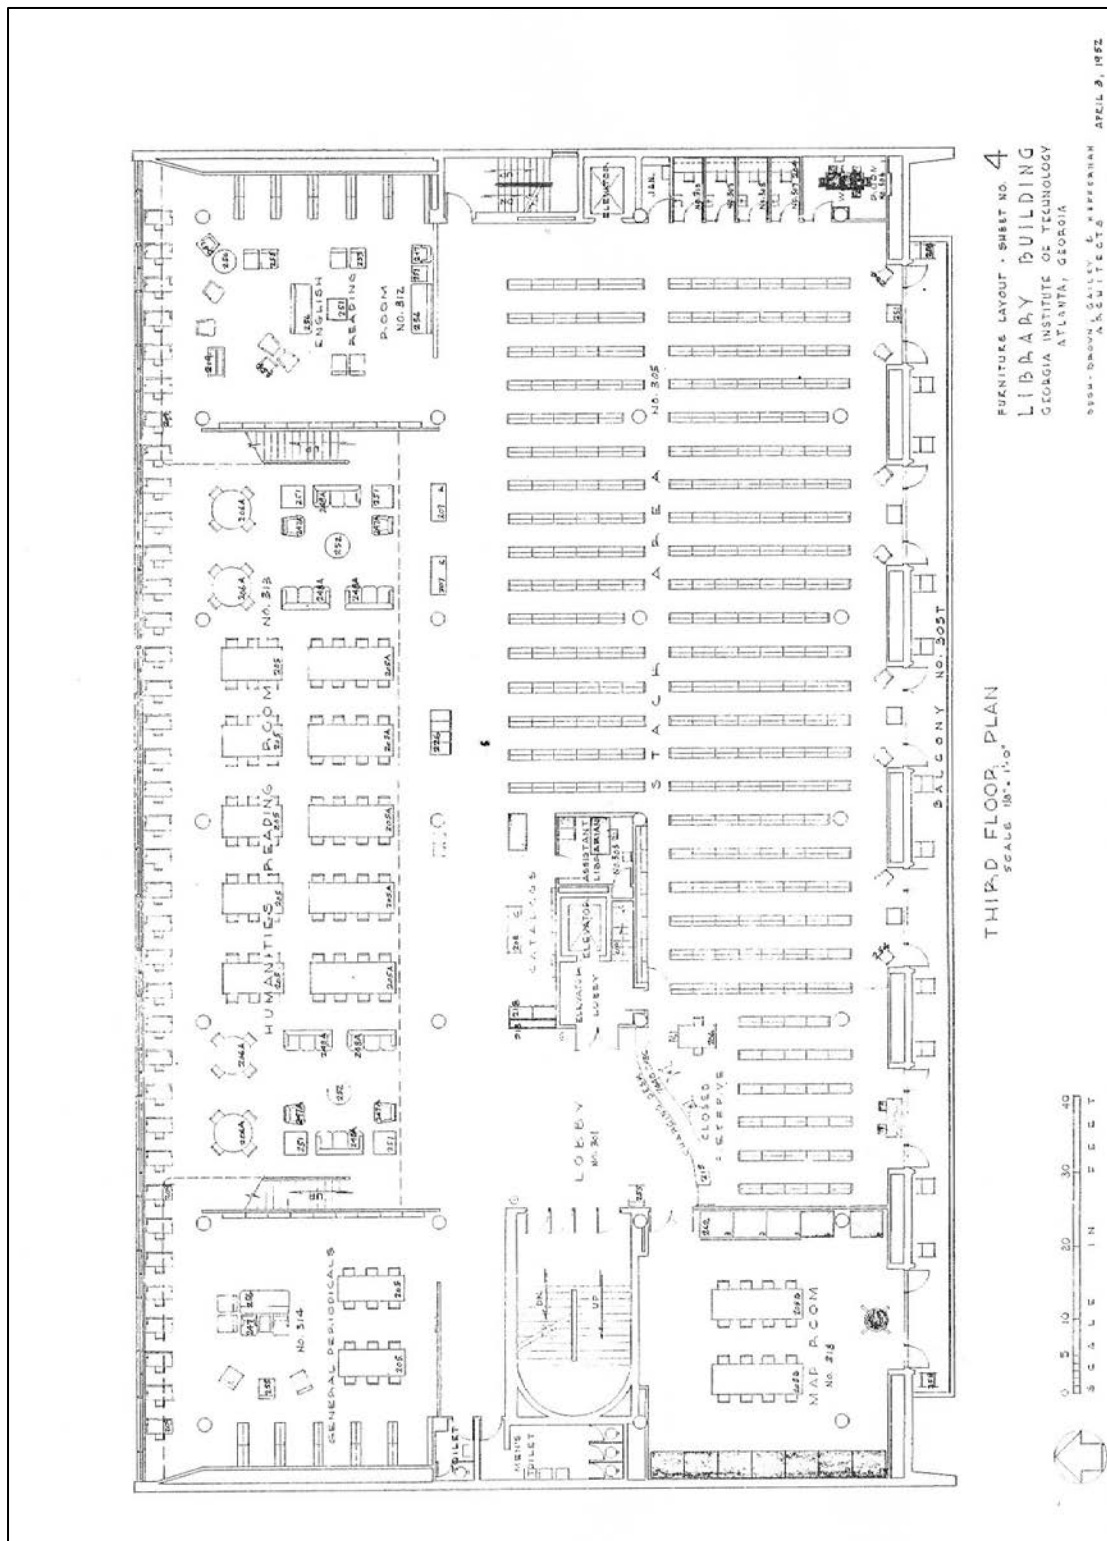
Original third floor plan and furniture layout; Dedication Brochure; Georgia Tech Archives. UA415A, Series 3: Subject Files: Buildings and Grounds, ca. 1900-ca. 2011, Box VF35, Folder 24.
